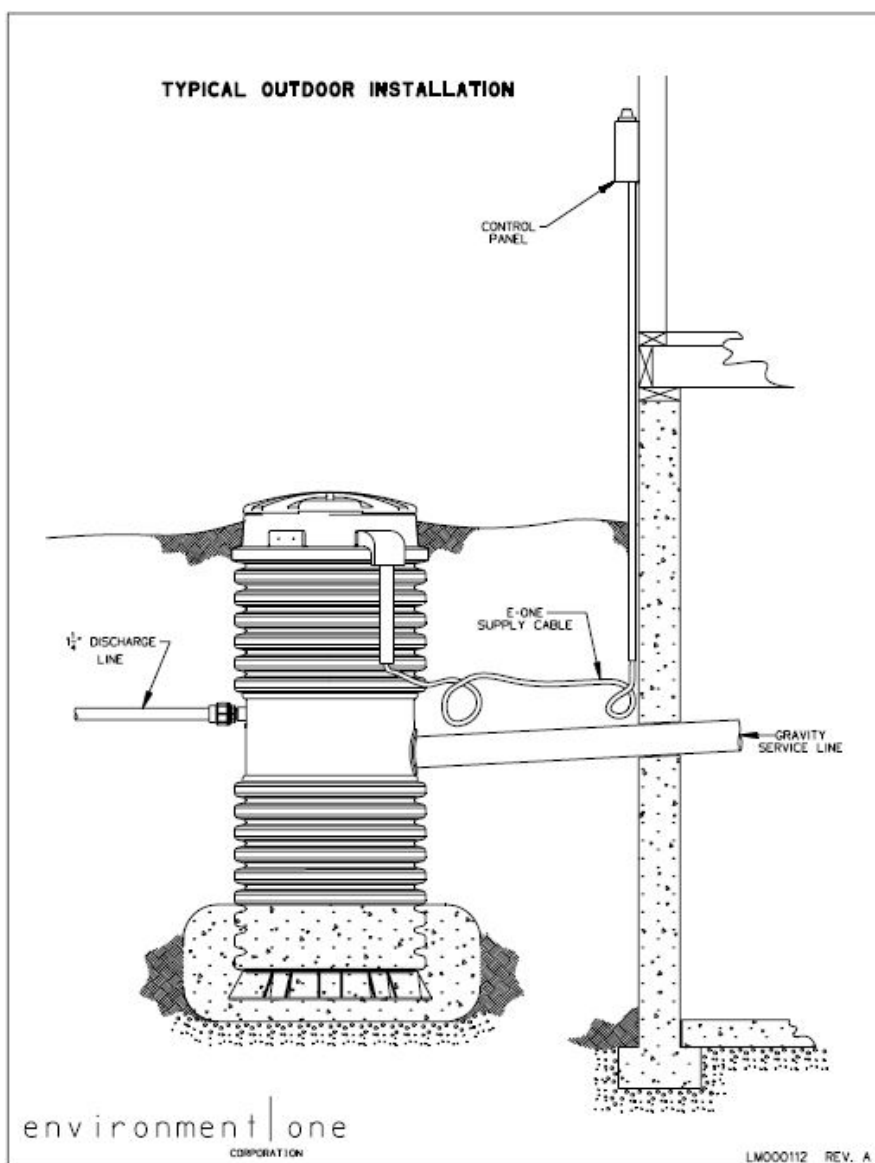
Typical outdoor installation of force main grinder pump and storage tank (Environment One Corporation, n.d.)
